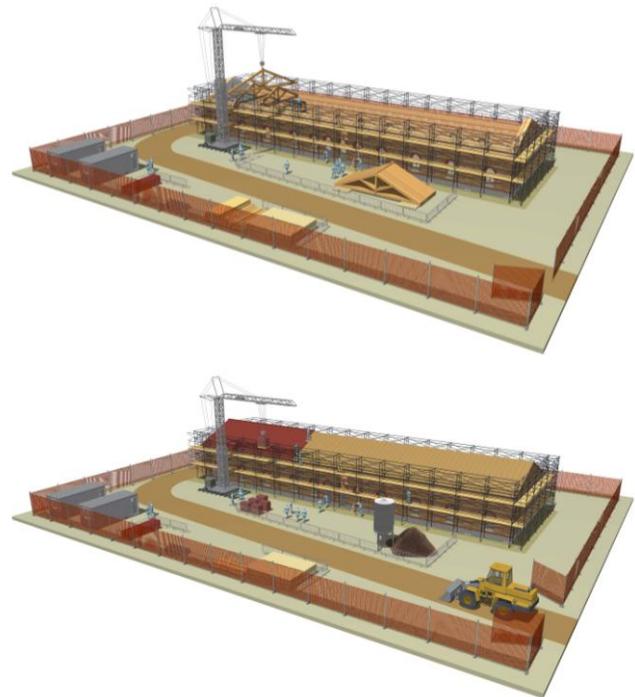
(a, b), use the 3D model for worksite and planning. First phase: setting up of building site and surroundings, demolition, existing covering removal and new truss positioning. Second phase: conclusion of covering system installation, wall restoration, frameworks, inside works, plants and finishings, outside arrangements
